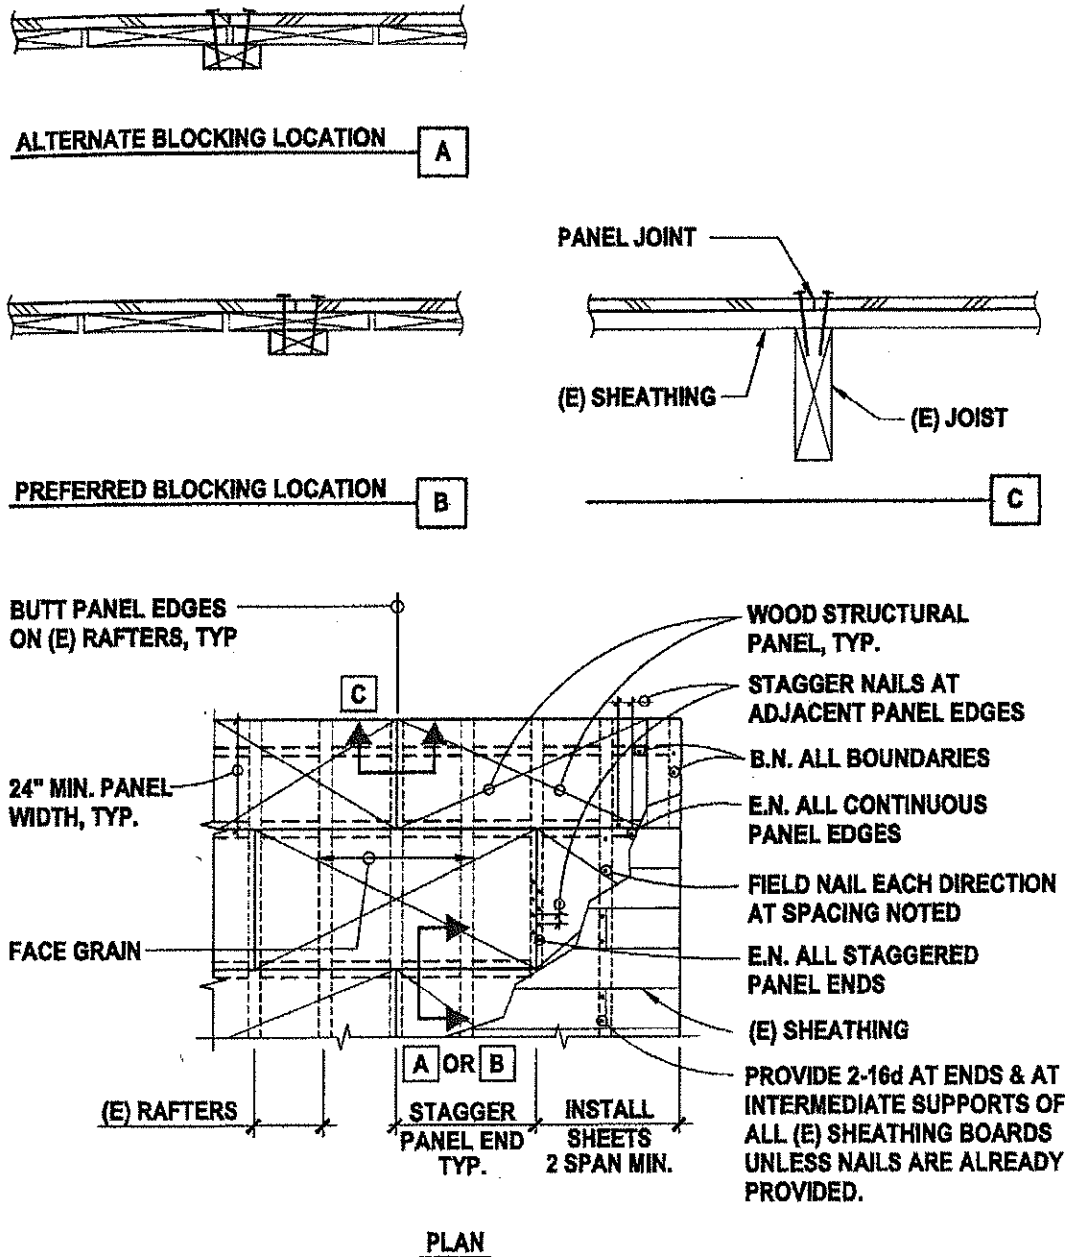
Wood Panel Overlay with Blocking Over Existing Sheathing
